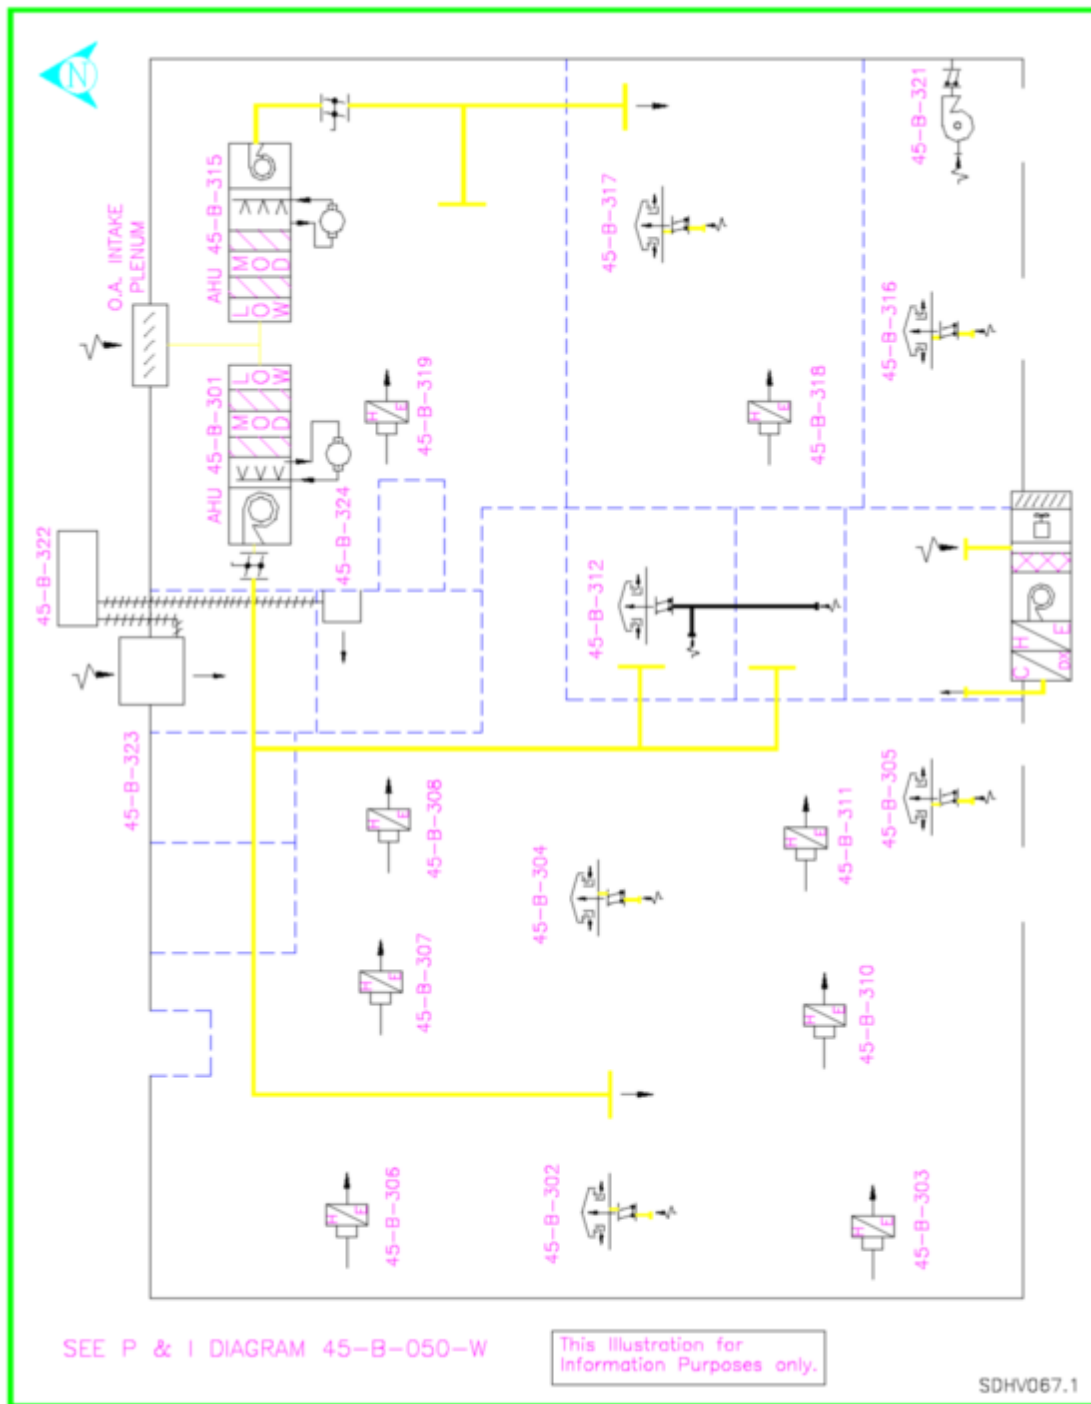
HV05 Warehouse Building HVAC Block Diagram
